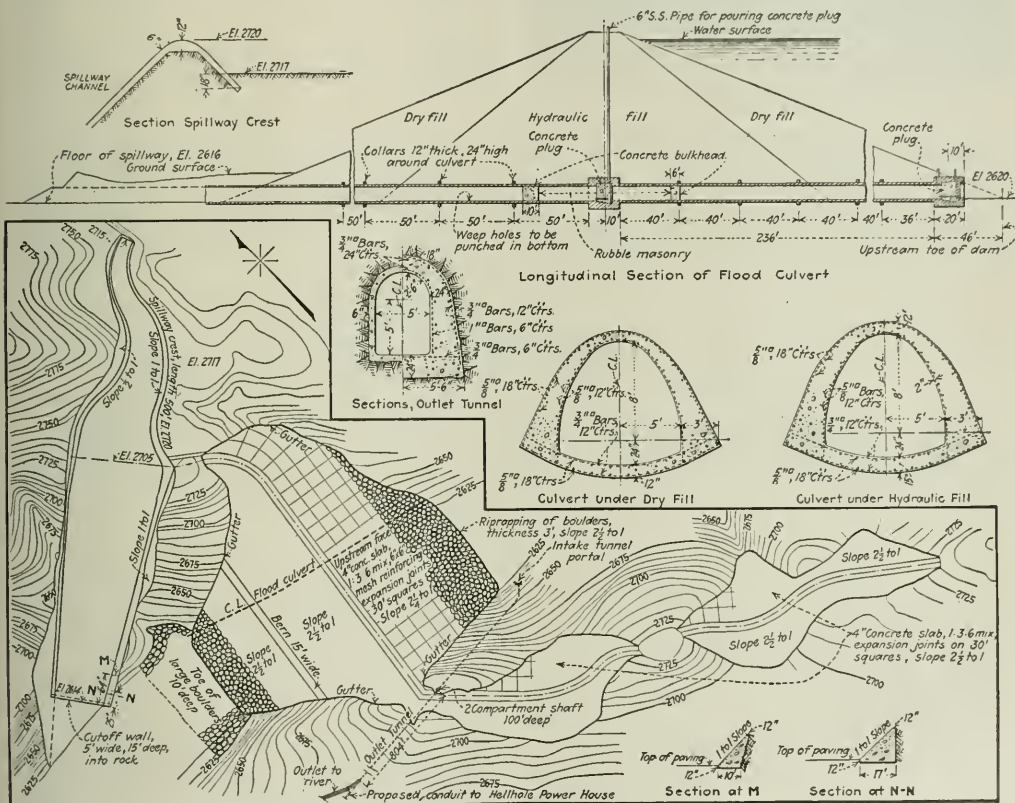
PLAN, SECTION AND STRUCTURES OF THE HENSHAW DAM
